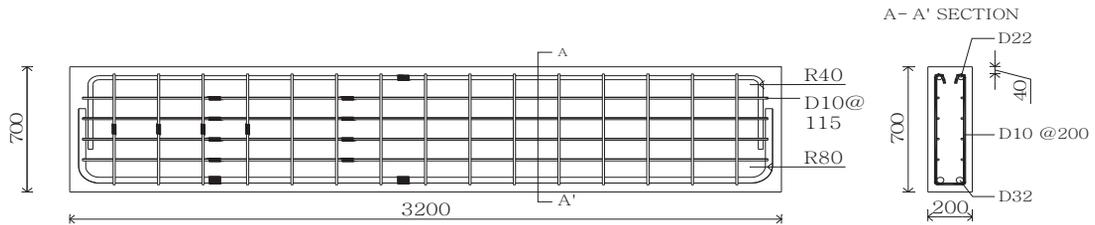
Elevation and cross sectional details of deep beam (Steel gauges are marked as —.)
